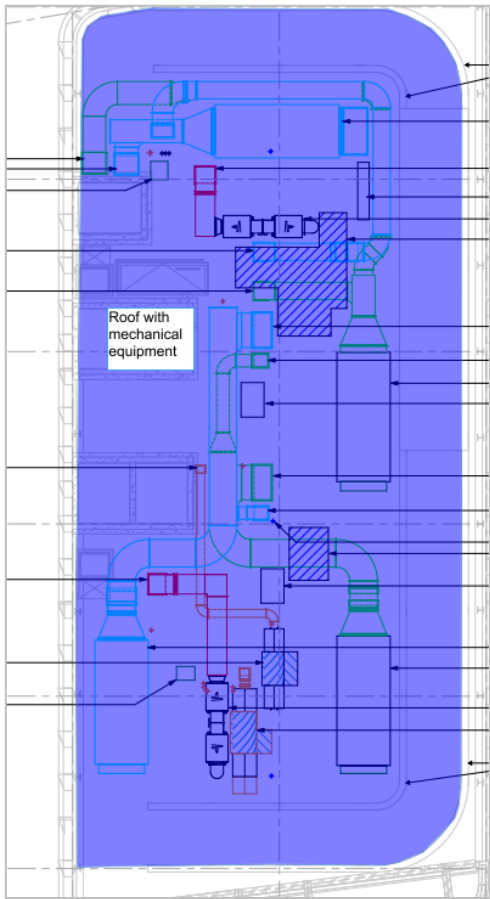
1 Museum Street roof, allocated to mechanical equipment
